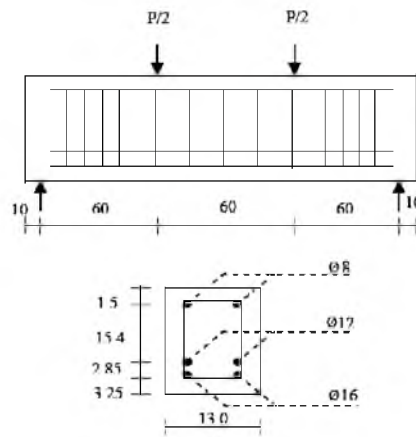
Geometry, loading, and beam reinforcements. (Dimensions in cm.)
